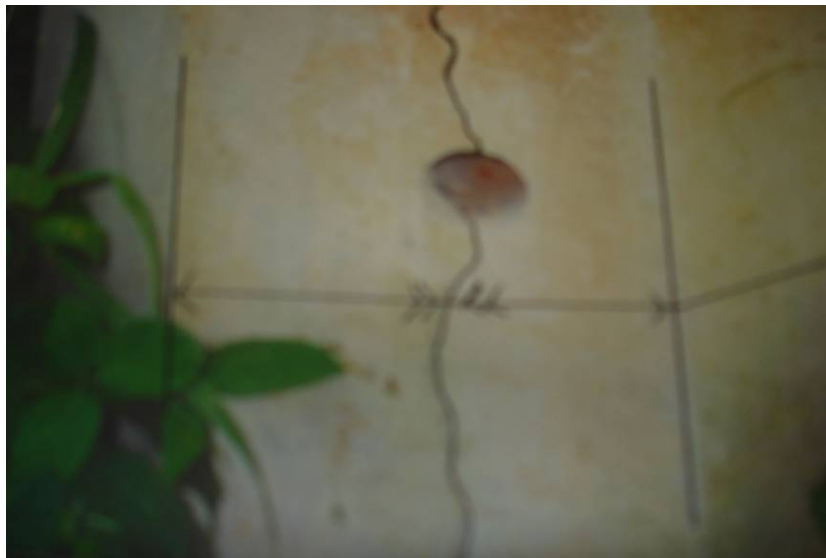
Typical ASR cracking in a prestressed pile
